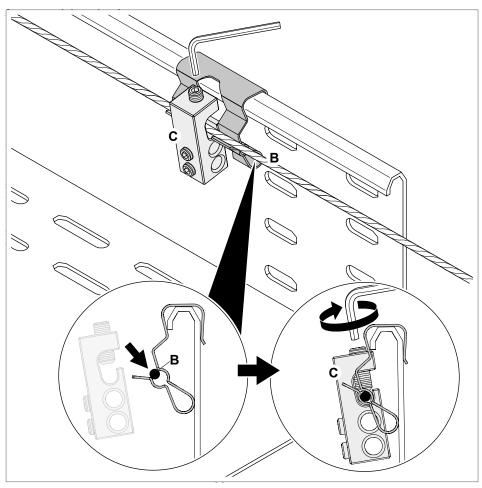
Connection of clamp spring, conductor cable and connection terminal
